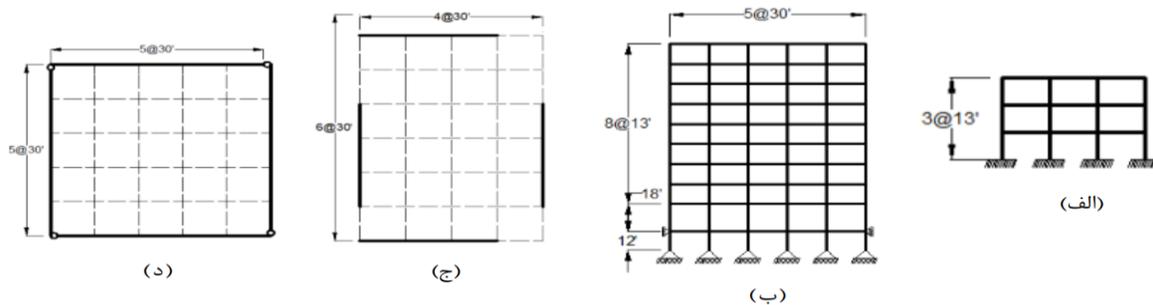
Plans and elevations of 3 and 9 story SAC frames
